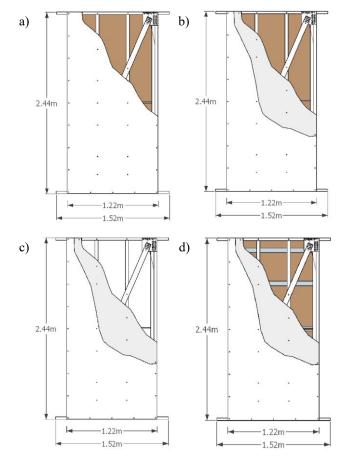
Shear wall configurations – strap-braced CFS frame and gypsum panels: a) one layer of gypsum on both sides, b) two layers of gypsum on both sides, c) two layers of gypsum on one side, and d) two layers of gypsum on one side and two layers of gypsum and resilient channels on the other side
